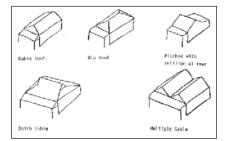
Example of Typical Queensland Vernacular Roof Designs (extracts from *Design Guidelines for Rural Townships*). A4.2 Roof forms are not mansard or domed.
